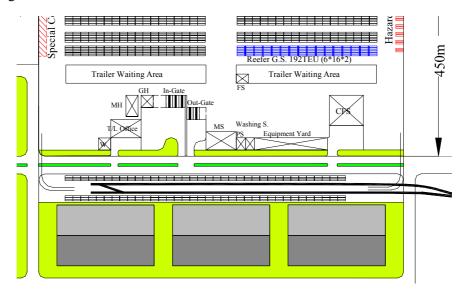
B-2 Container Terminal Layout (Future: In Case of Introducing Railway)
